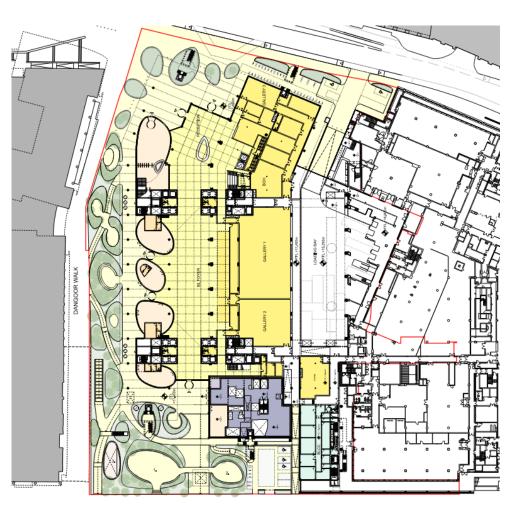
Proposed Lower Ground floor plan (RSHP, 24-09-2021)
